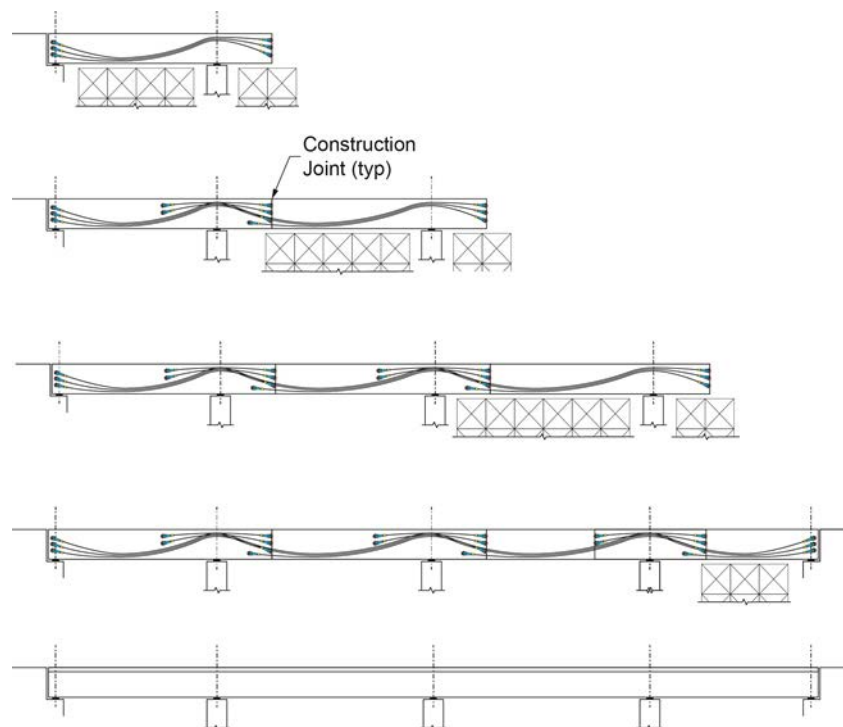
Possible Tendon Layout for Sequentially Cast Spans
